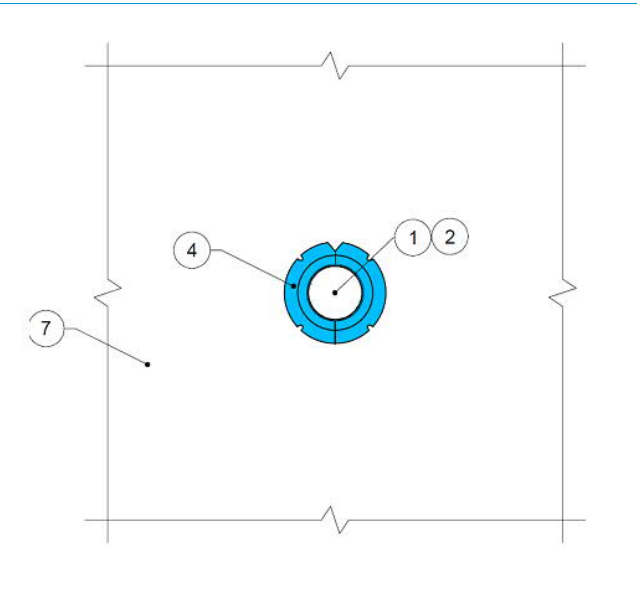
Plastic pipe with PROMASEAL® FCS 40 – 100 collars (floor underside plan view)
